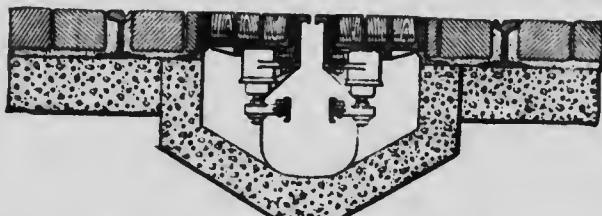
,541.—Insulating Pit, showing Hand-hole Covers
